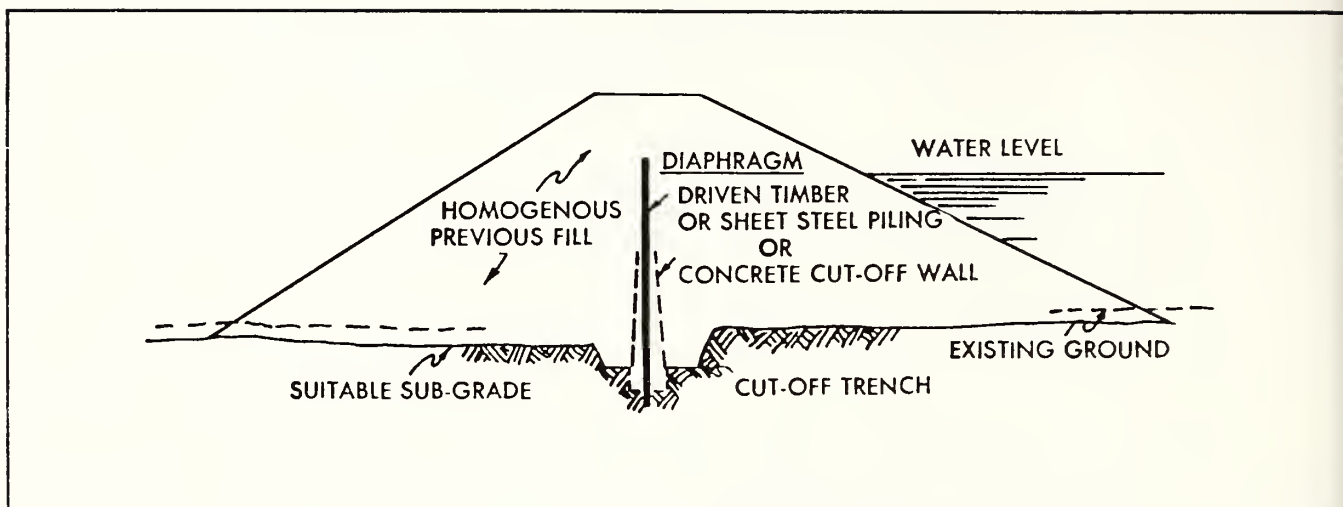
Plans for construction of a typical diaphragm embankment.
